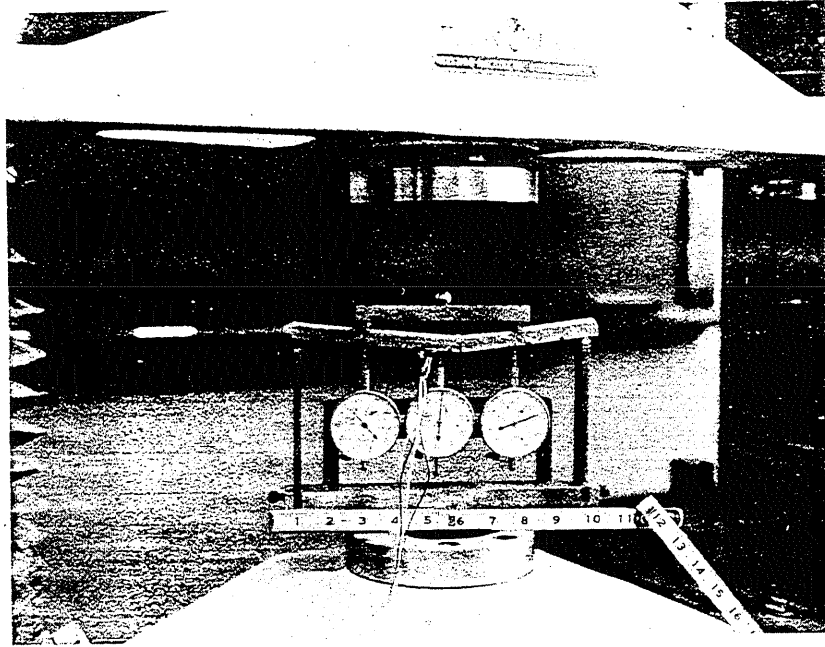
BEAM SPECIMEN AFTER TEST TO FAILURE
